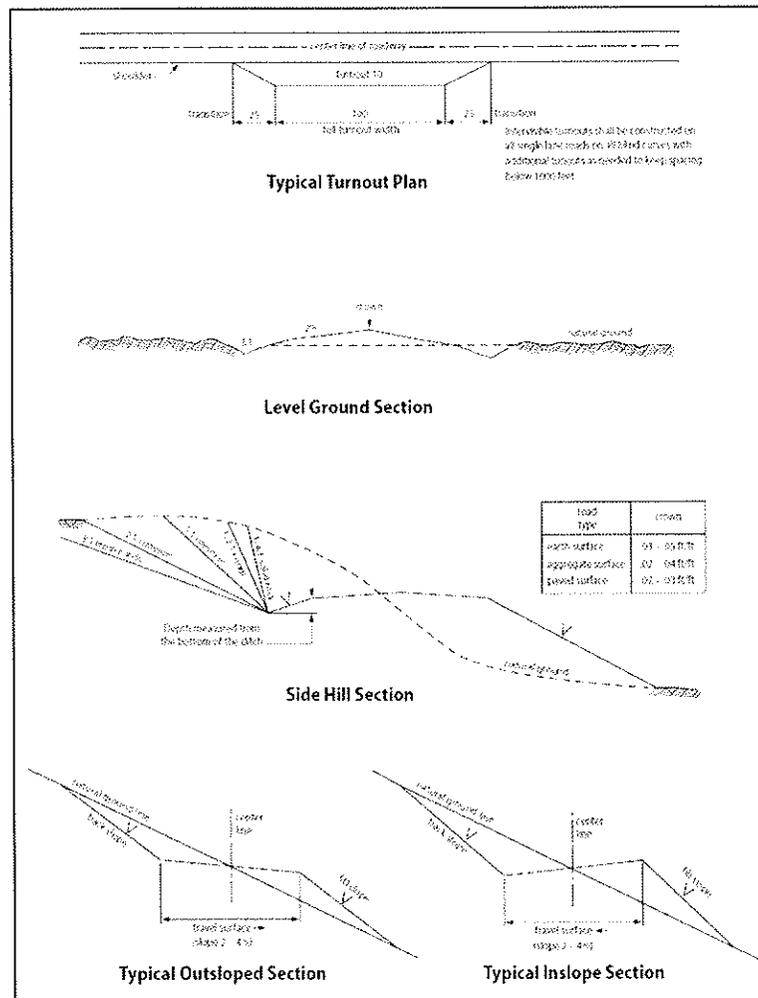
Typical road cross sections (BLM and USFS 2007).
